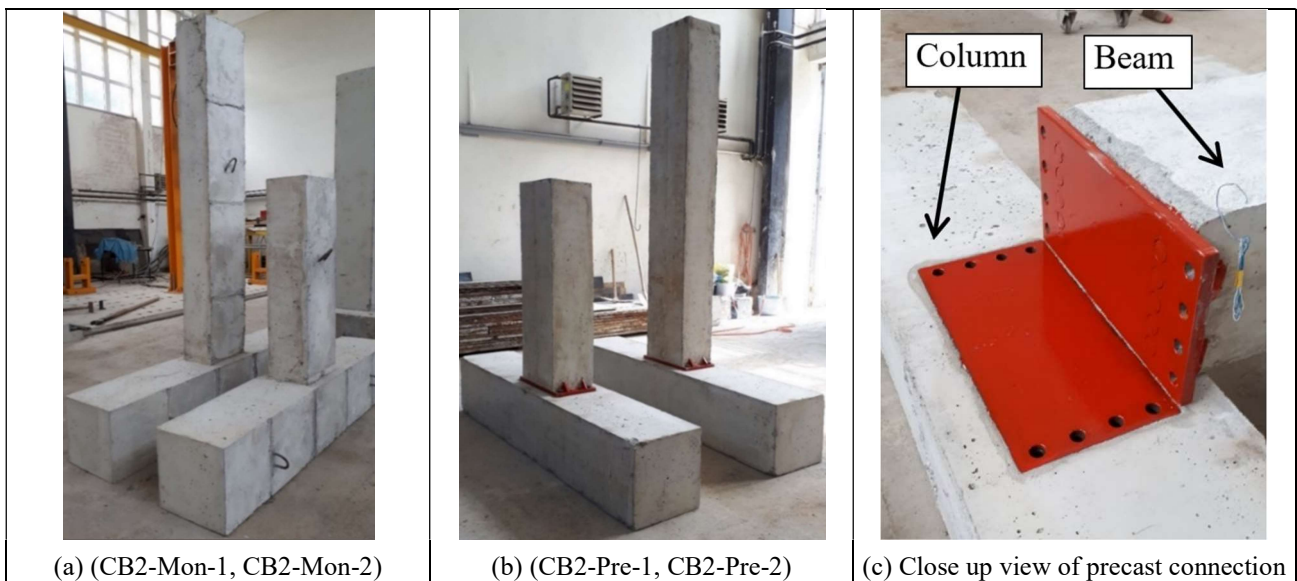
General view of CB2 monolithic and precast specimens with 1.0 and 2.0 m beam length and the close-up view of the adopted precast connection
